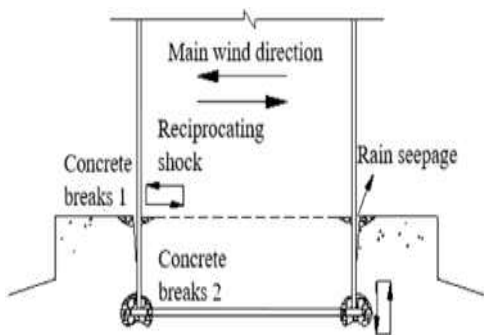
Damage mechanism of embedded-ring foundation [9]
